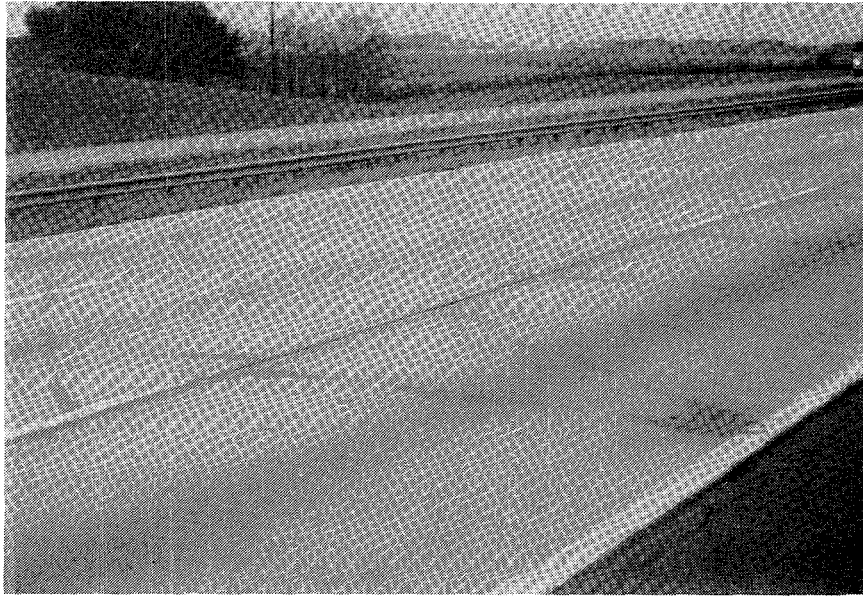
Illustration of the effect of swelling clays on a jointed reinforced concrete pavement (JRCP-4, Dallas, Texas).
